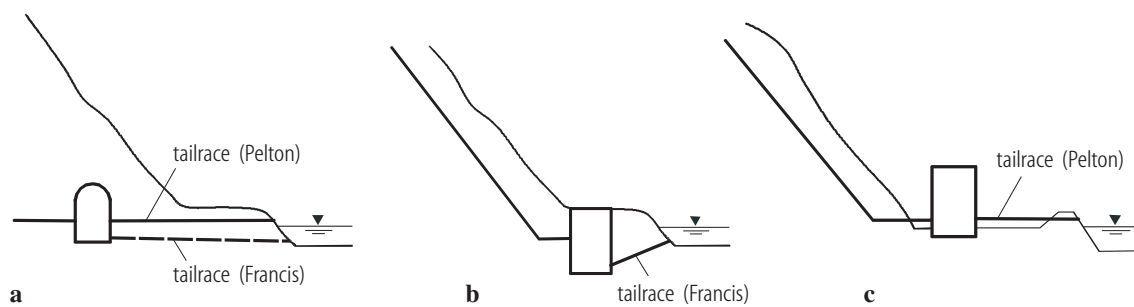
Schematic types of powerhouses. (a) Underground powerhouse. (b) Shaft powerhouse. (c) Open air powerhouse.
